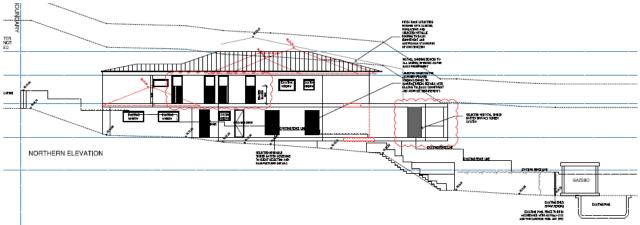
Proposed northern elevation (existing building outline shown in red)
